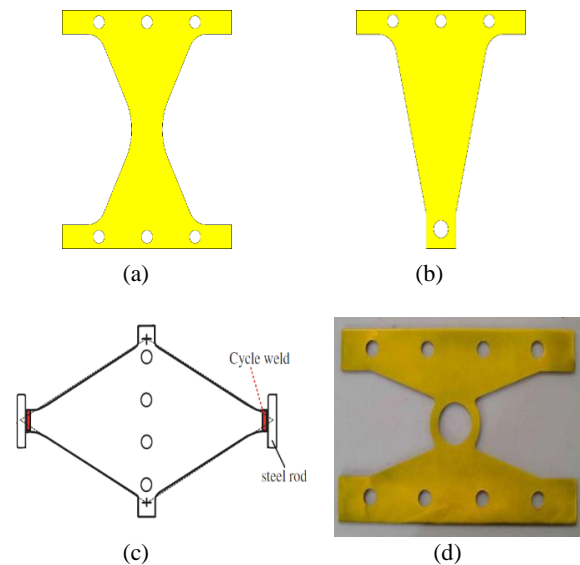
(a) ADAS damper; (b) TADAS damper; (c) Rhombic ADAS; (d) single round-hole steel damper [63]
